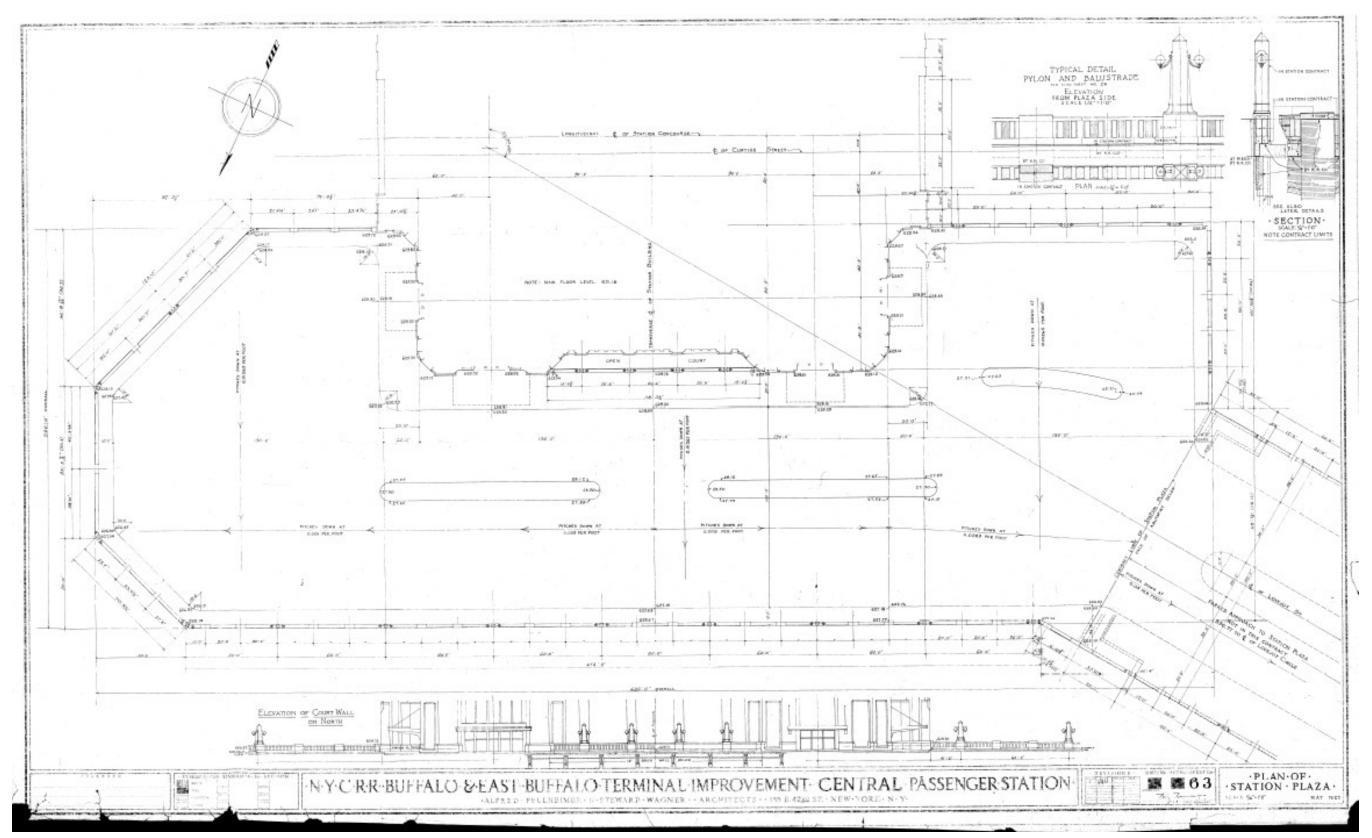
Fellheimer & Wagner, "Plan of Station Plaza," May 1927. (Fellheimer & Wagner Architectural Drawings of Railroad Stations in the United States and Canada, 1915–31, Avery Drawings and Archives Collections, Columbia University Libraries)
